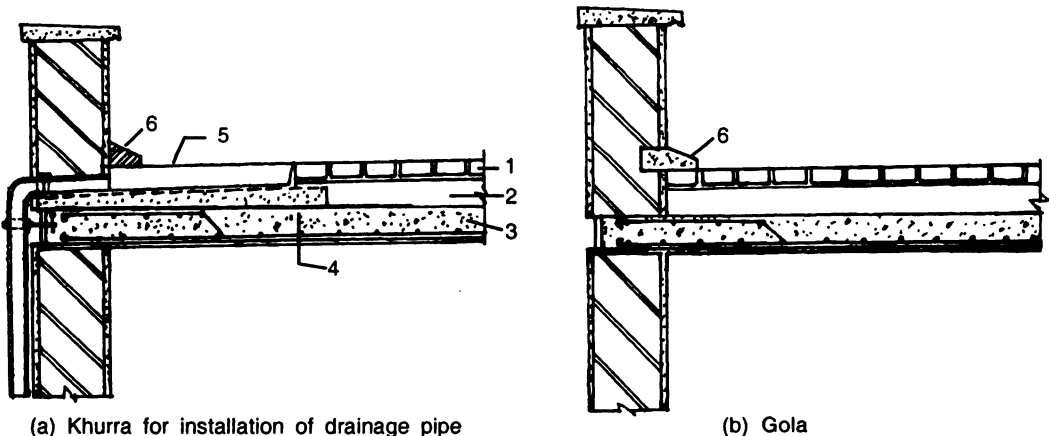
Construction of khurra and gola for good drainage and prevention of leakage of junctions in roof:
